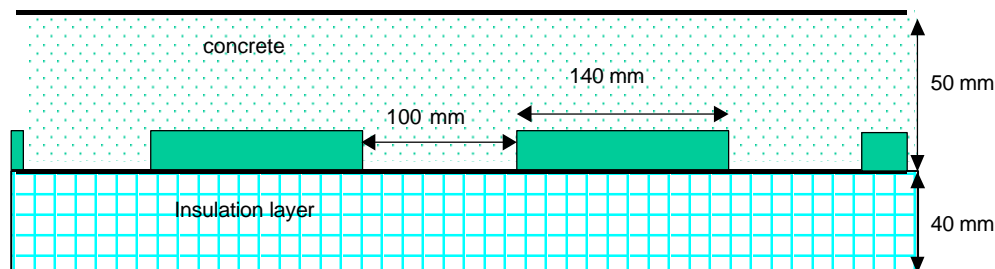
Cross-section of floor cooling with heat exchange plates in room 1.
